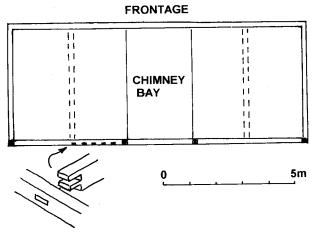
Hockley, The Bull. Ground plan, with detail of joint in rear wall.
